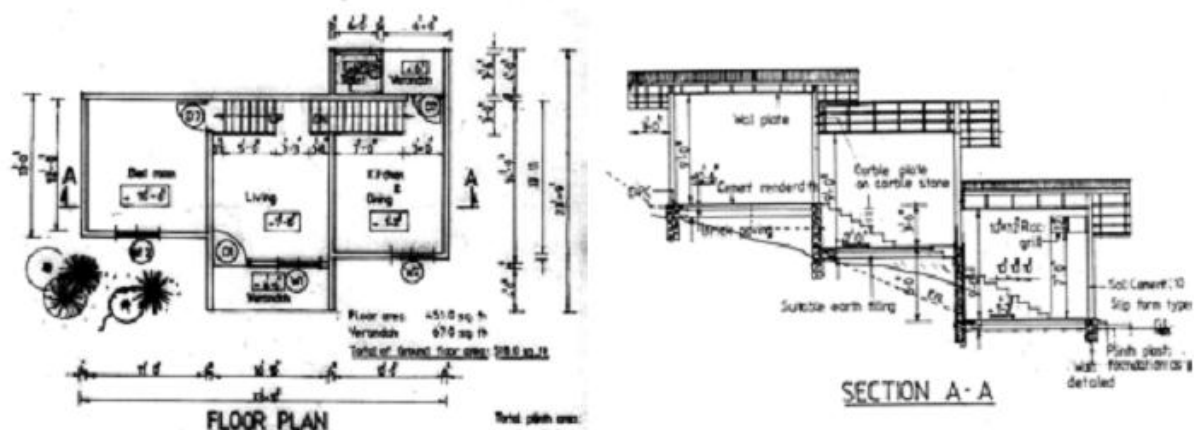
Plan & Section for houses in Ratnapura (Source: adpc, 2005)
